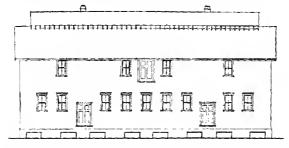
Fig. V.—Side elevation, four kiln evaporator. Note particularly the ventilating openings in the wall, which permit free entrance of air beneath the floor of the work-room to the air inlets in the walls of the kilns.
